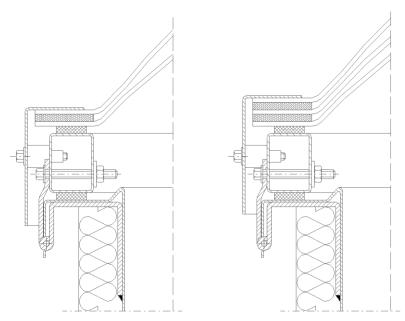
Typical glazings / fillings of mcr PROLIGHT skylight and roof access hatches..
